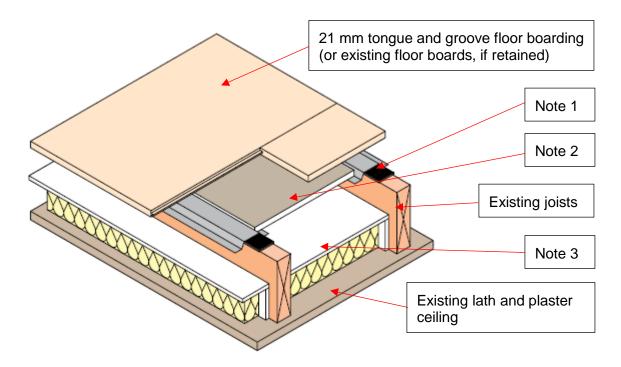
of Section 5 (Separating Floors) of the British Gypsum HomeSpec⁵ provides some recommendations which may be appropriate for consideration at The Assembly House. The aim of this detail is to avoid altering an existing ceiling and to minimise any increase to the thickness of the floor whilst improving the sound insulation of the separating element.
